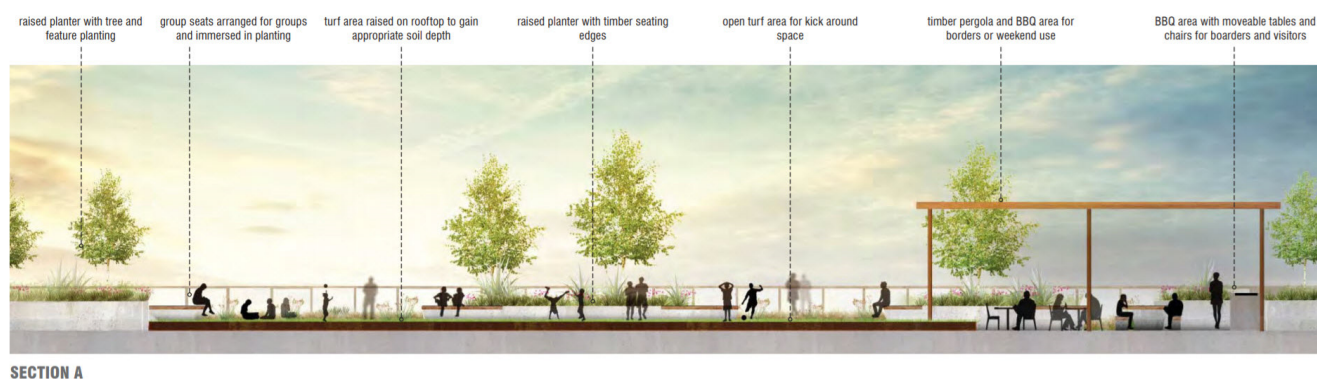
APPROVED Bishopsgate car park roof terrace: Landscape Design (Source: Oculus, Landscape Design Report 2016)
